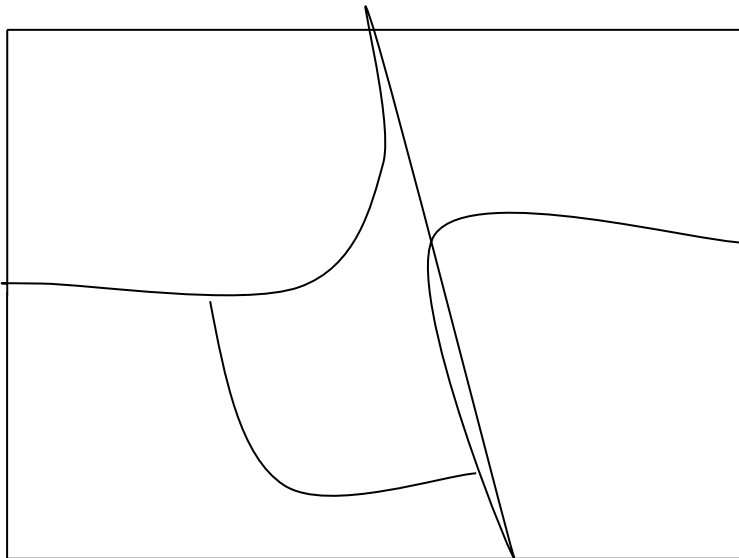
Sketch illustrating cracking of the slab under uniform loading
